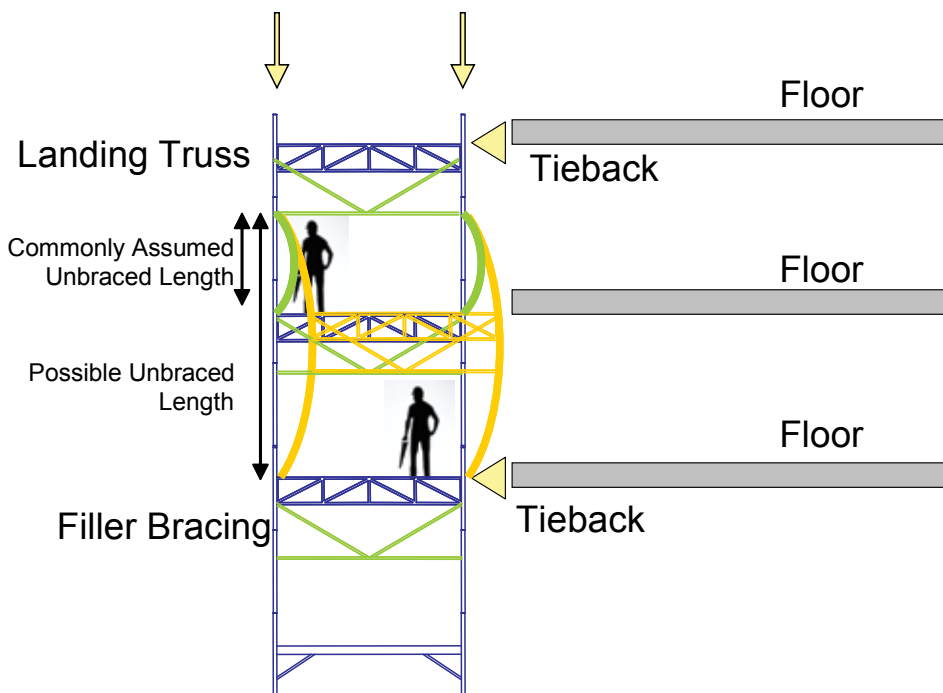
An elevation through the hoist complex, showing partial bracing.
